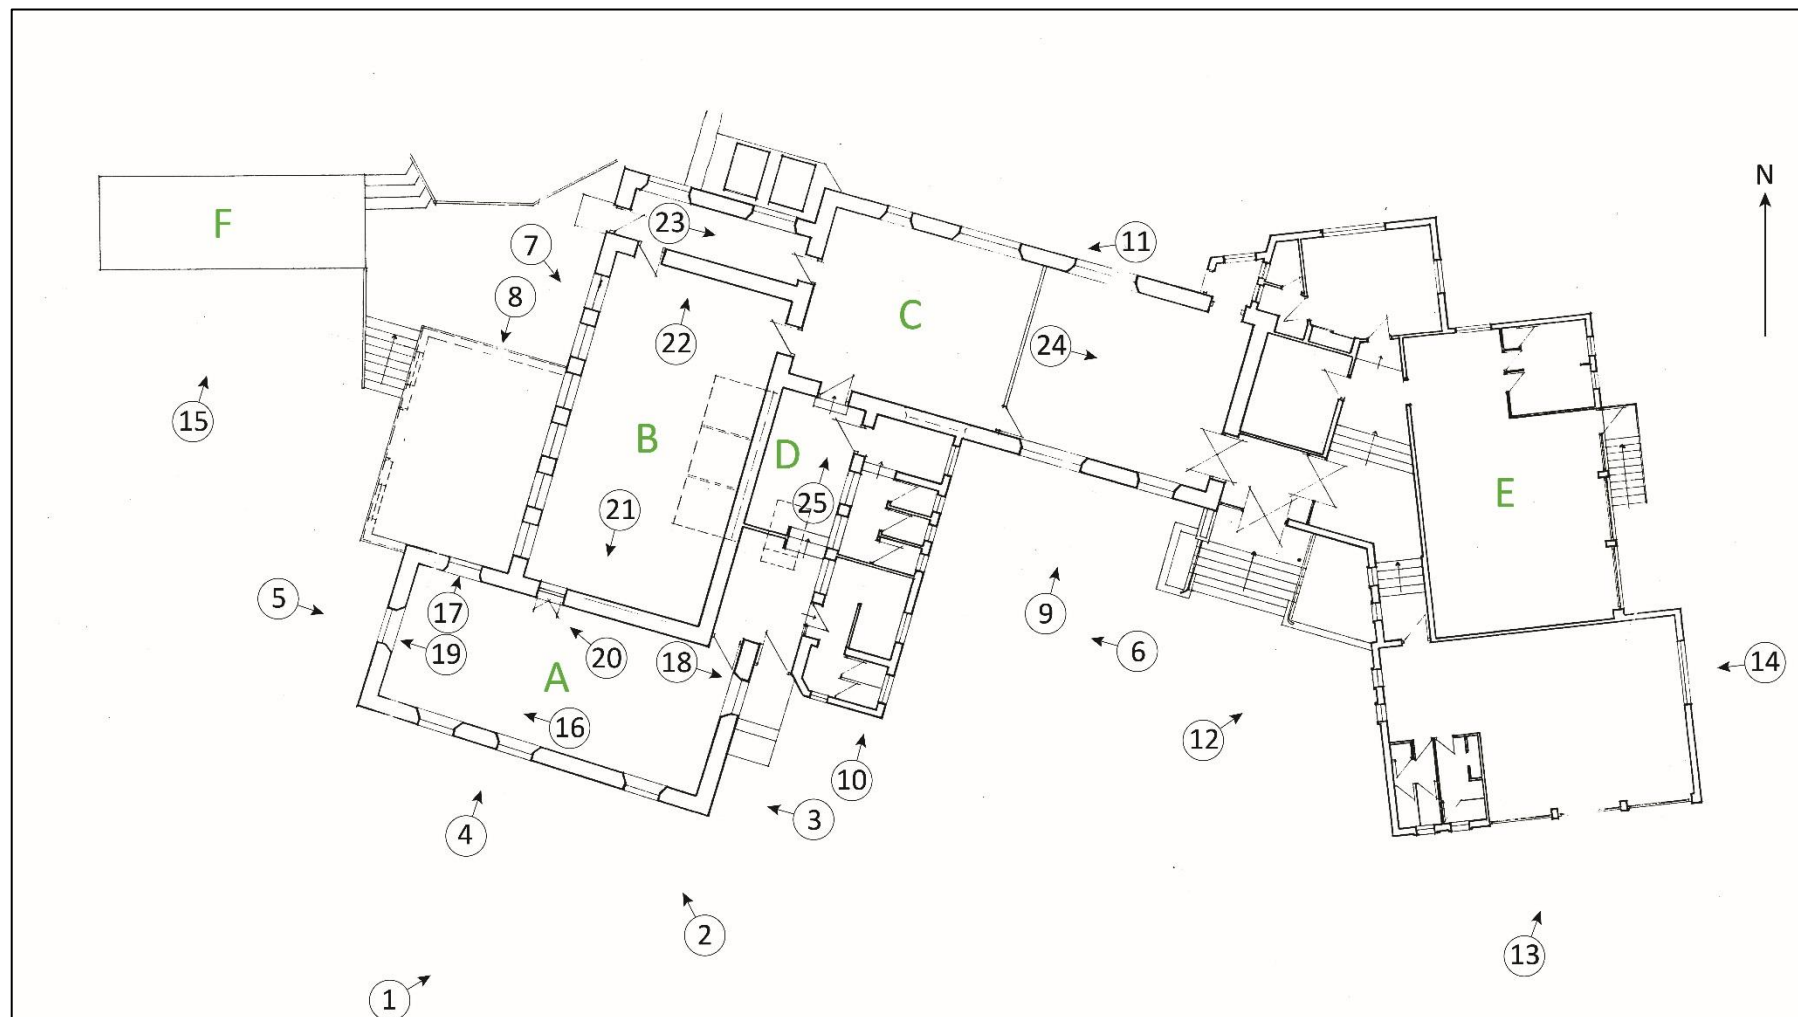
Sketch plan of former school buildings at Carn Thomas (not to scale) showing location of external and internal photos taken
